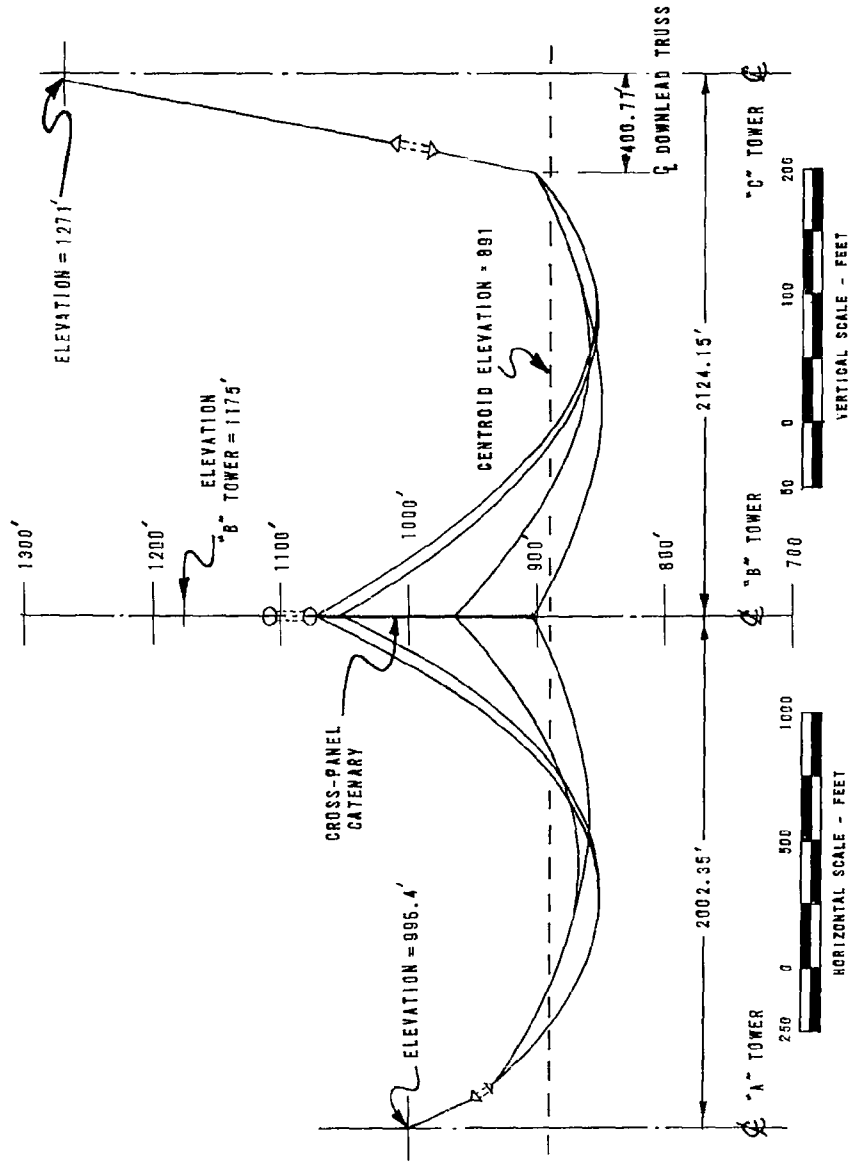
ELEVATION VIEW OF LONGITUDINAL PANEL CROSS SECTION
